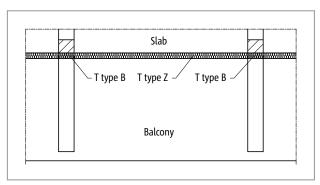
Schöck Isokorb® T type B: Balcony structure with freely cantilevered downstand beams (precast balcony)
